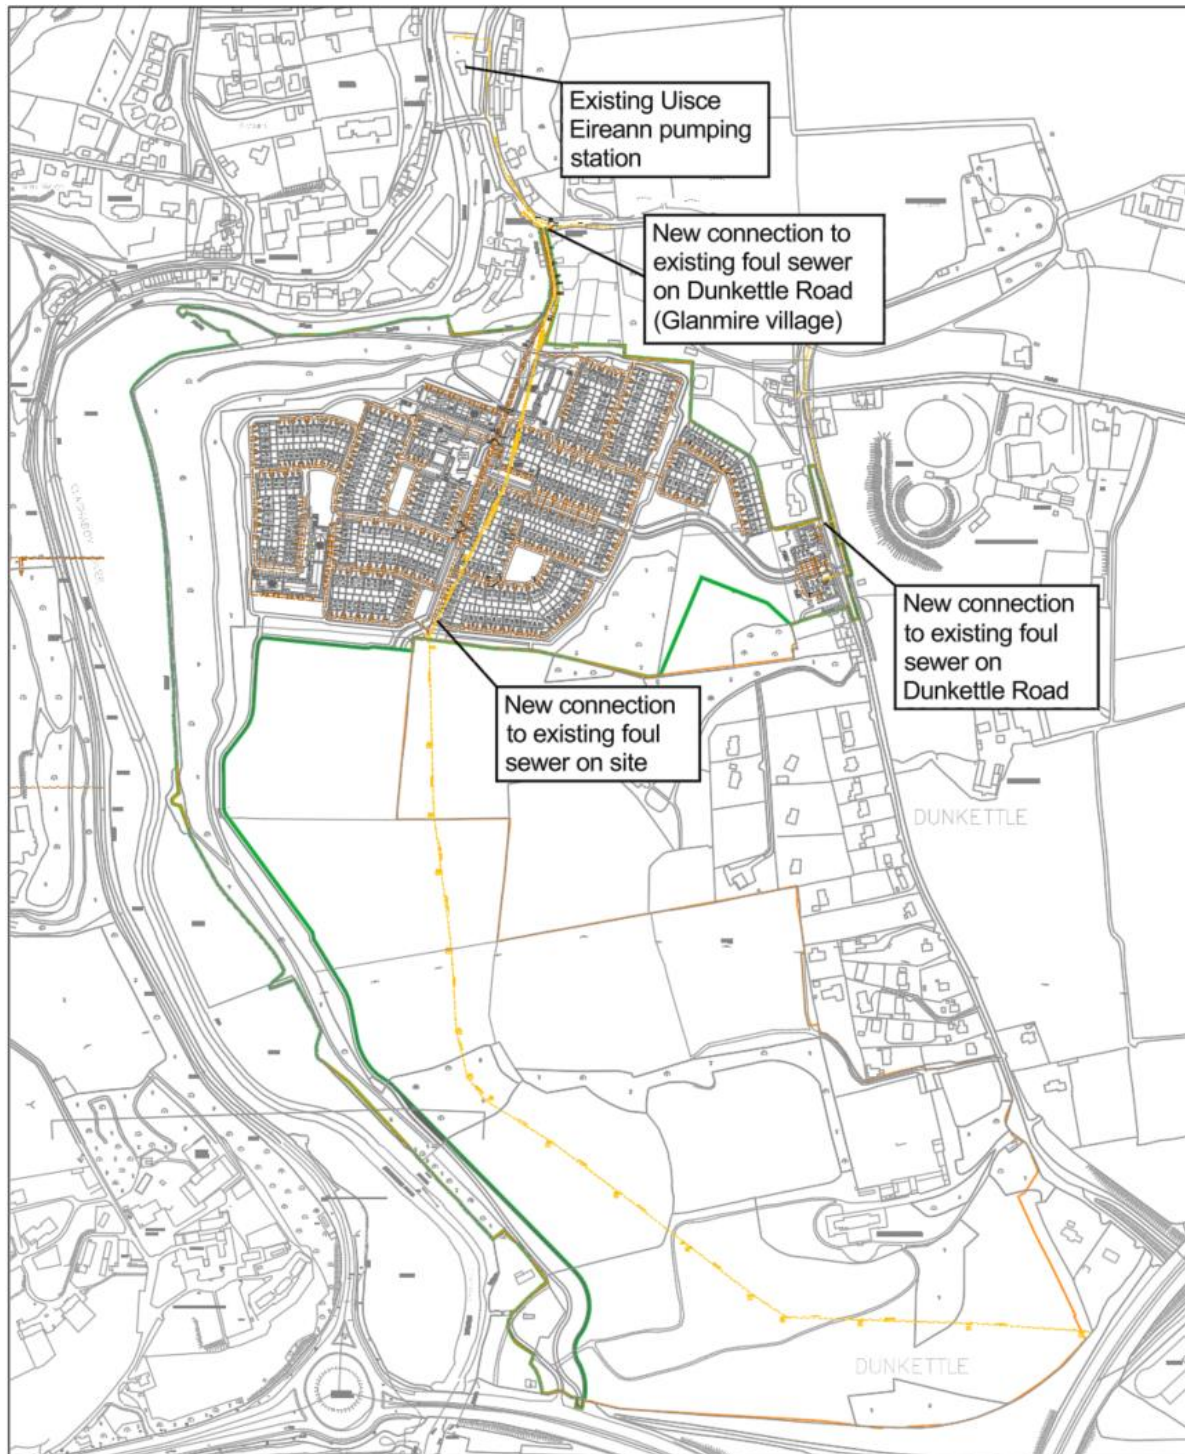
Phase 1 wastewater drainage network and connections to existing infrastructure
